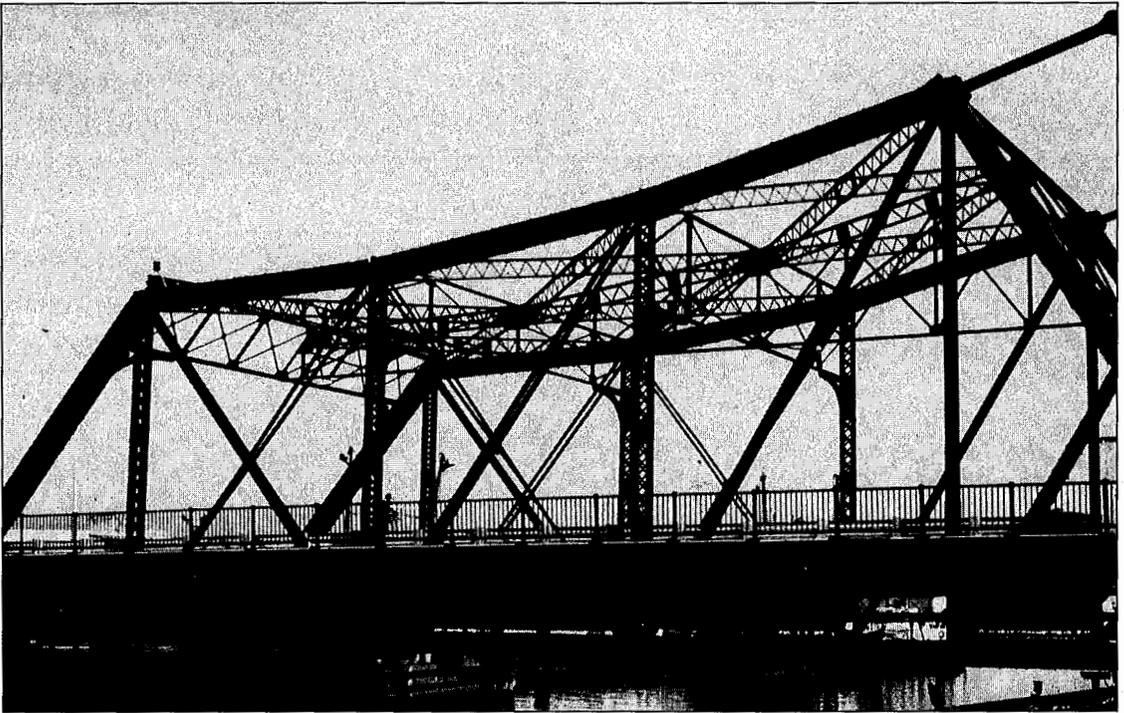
The west end of the New Bedford-Fairhaven Bridge.
